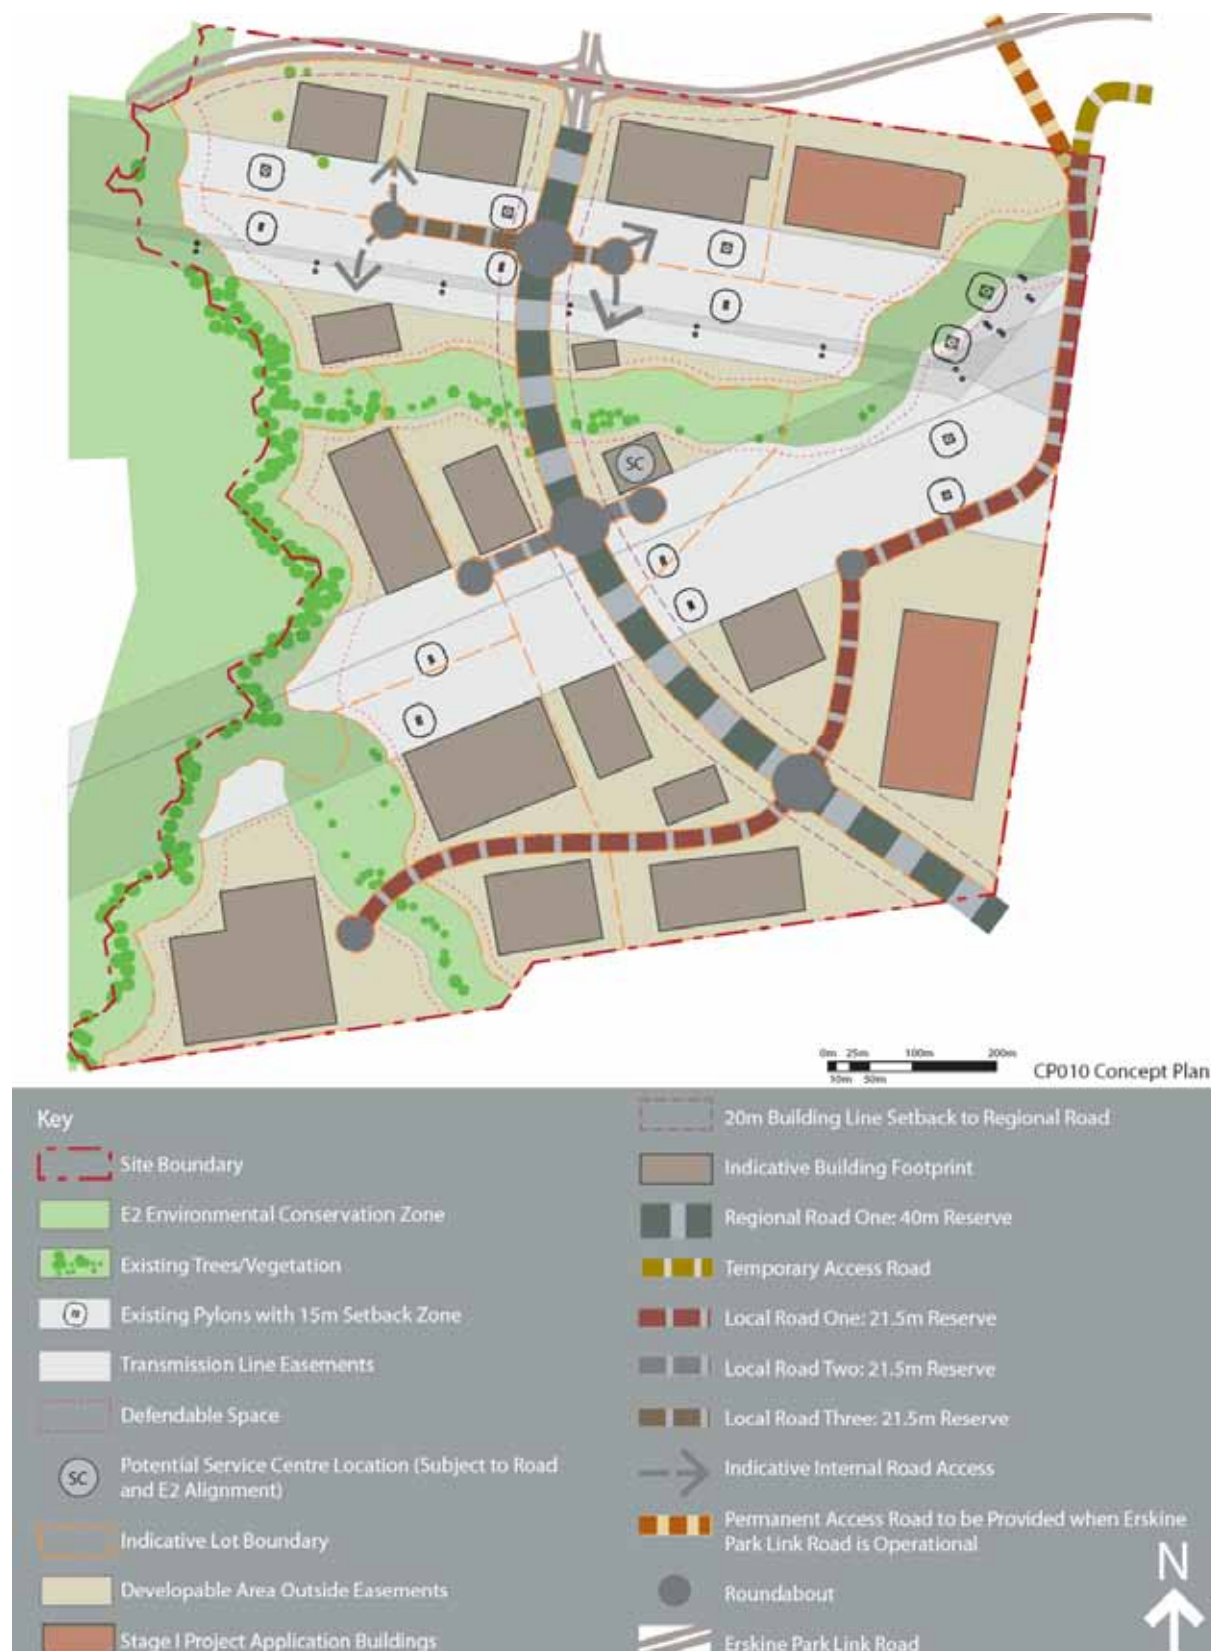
Ropes Creek Employment Precinct Concept Plan
